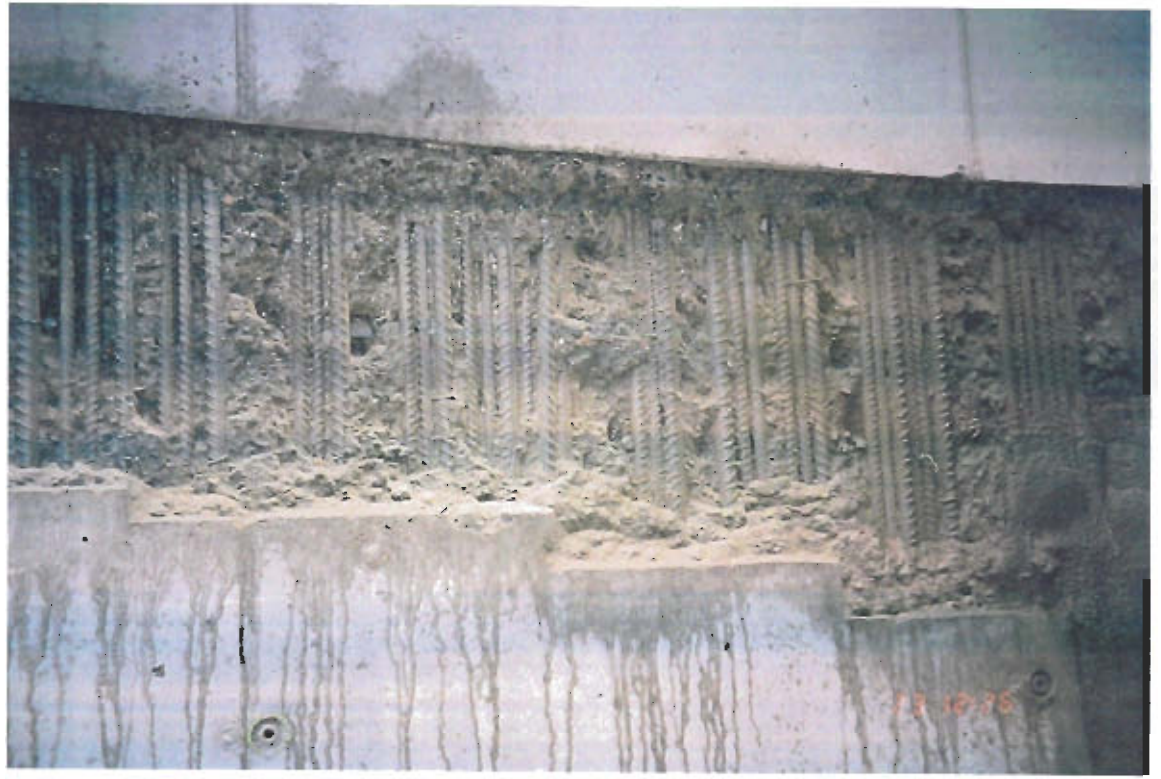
Removal of defect concrete. Damaged concrete was removed by cutting with pneumatic handheld hammers and the edges of the repair was cut with a diamond saw at an angel of 90° to the surface. The concrete behind the bars was not removed.
